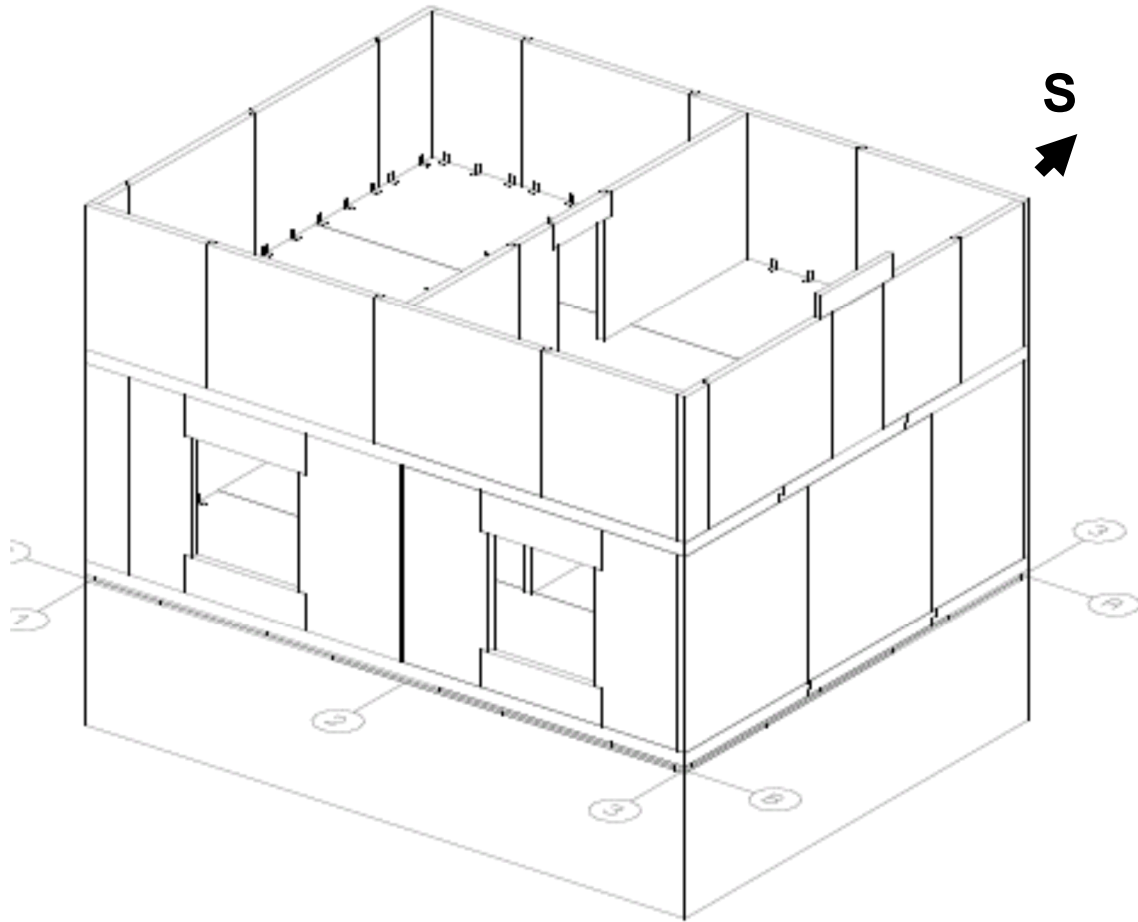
Apartment (fire floor) layout (all measurements in m).
